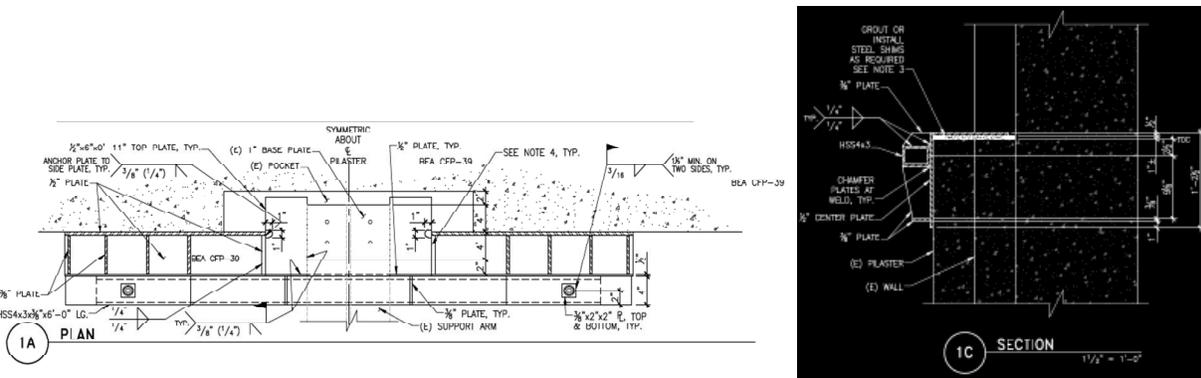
Upgrade Design – East Pit East Wall Plan and Side View
